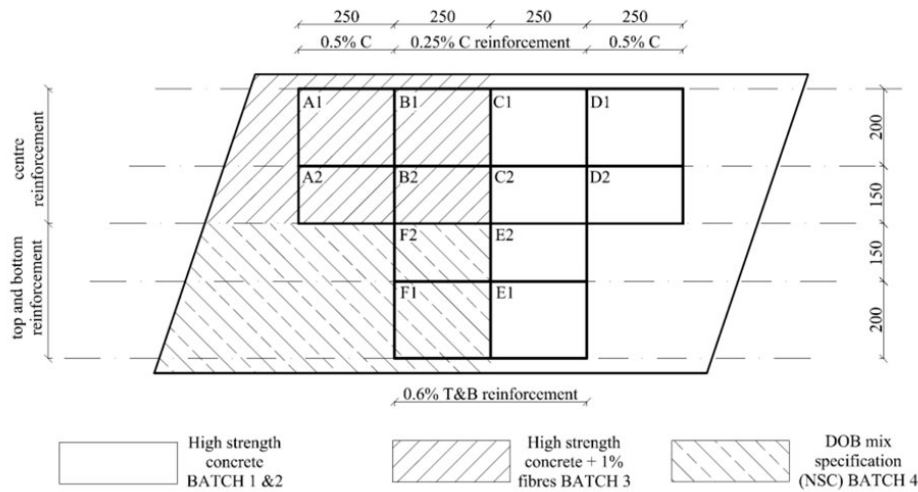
Corick bridge experimental campaign: slabs arrangement (dimension in cm) [Taylor et al., 2007].
